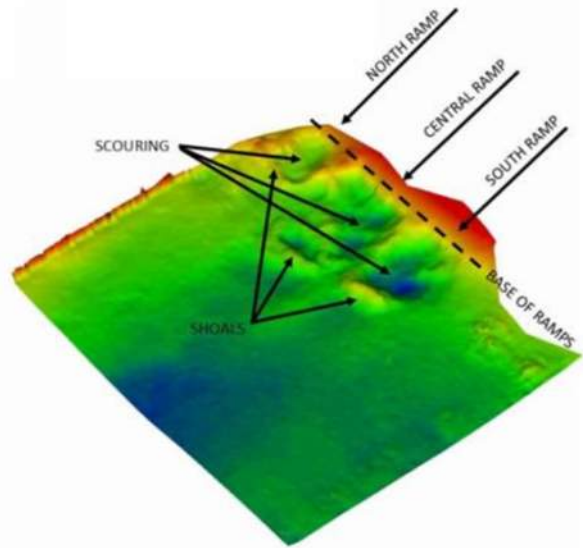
Bathymetric survey imaging of launch ramp scour holes
